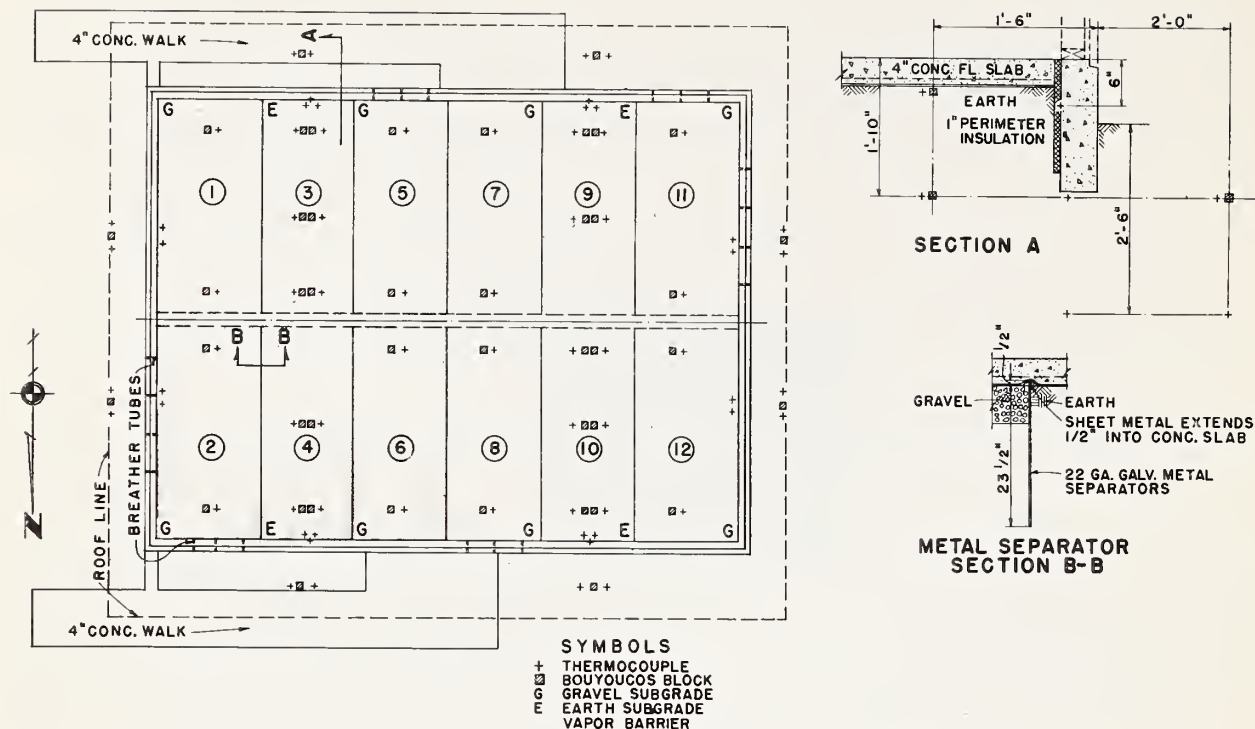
Plan of floor slab, method of dividing the bays, and foundation and floor construction details.
